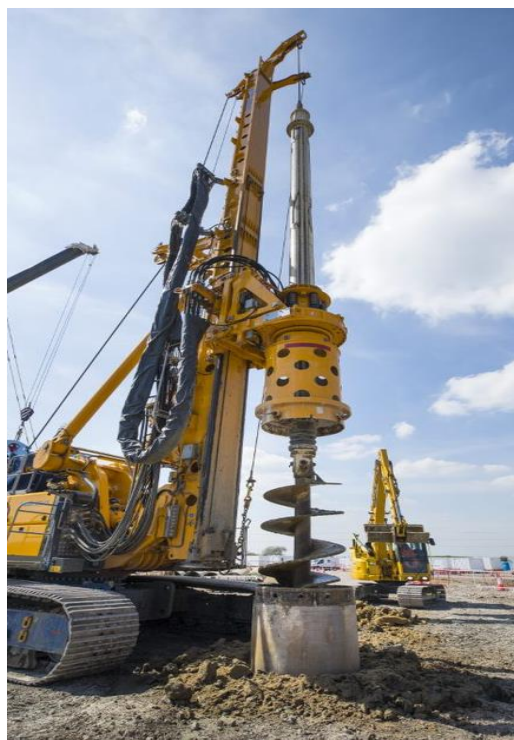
The above image shows our teams carrying out piling works for the Princes to Aylesbury Railway bridge, April 2022.
